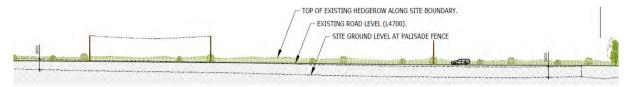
Proposed Elevation along Road L4700 (2 of 2)
